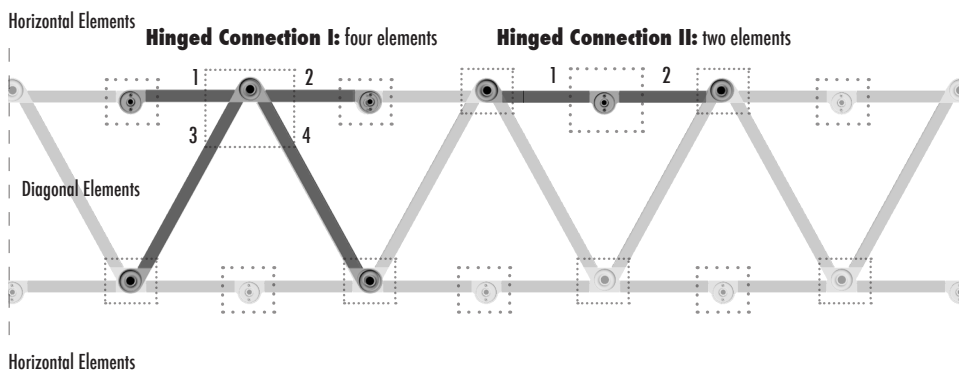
| The hinged connections and the structural elements in DeMoLi Bridge, scale 1:50
